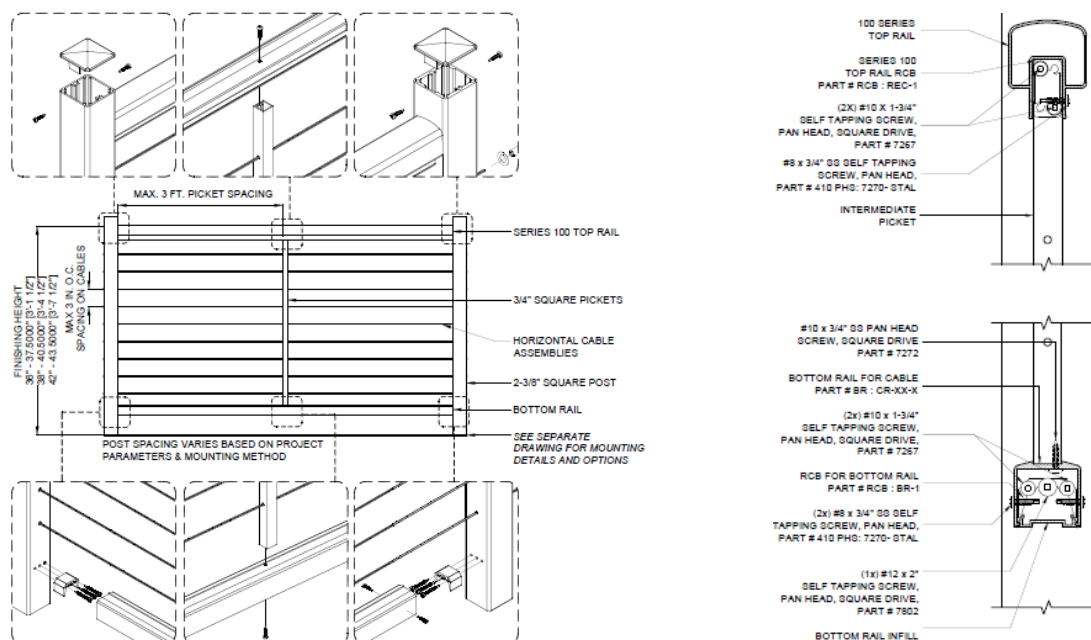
Series 100 and 150 Horizontal Cable Assembly (Series 100 shown with bottom rail)
